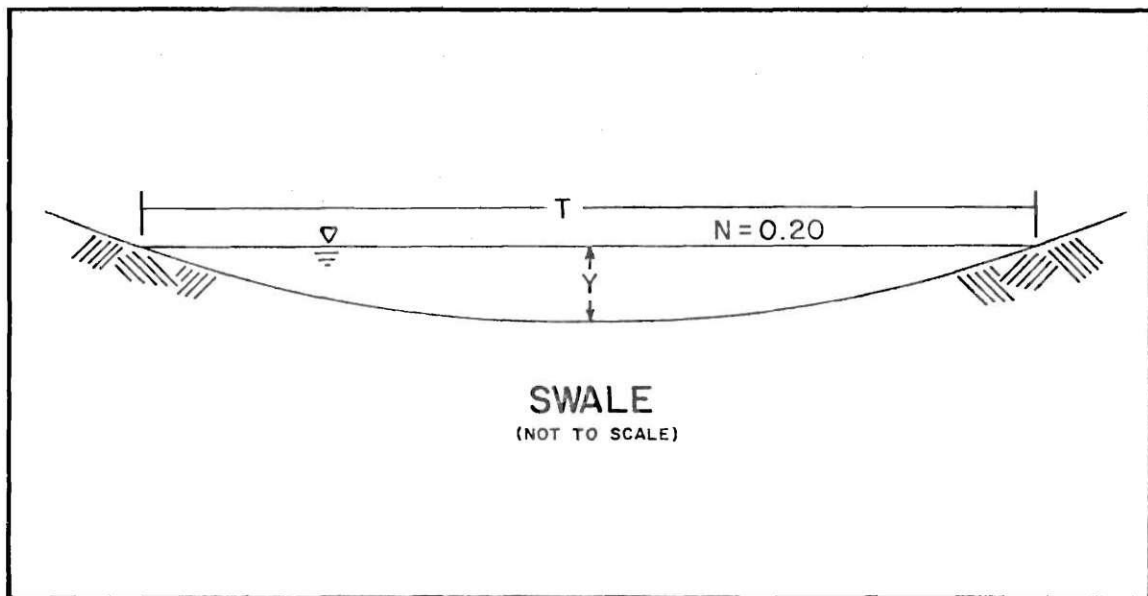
Cross-section of Natural Swale Used in Hypothetical Watershed.
